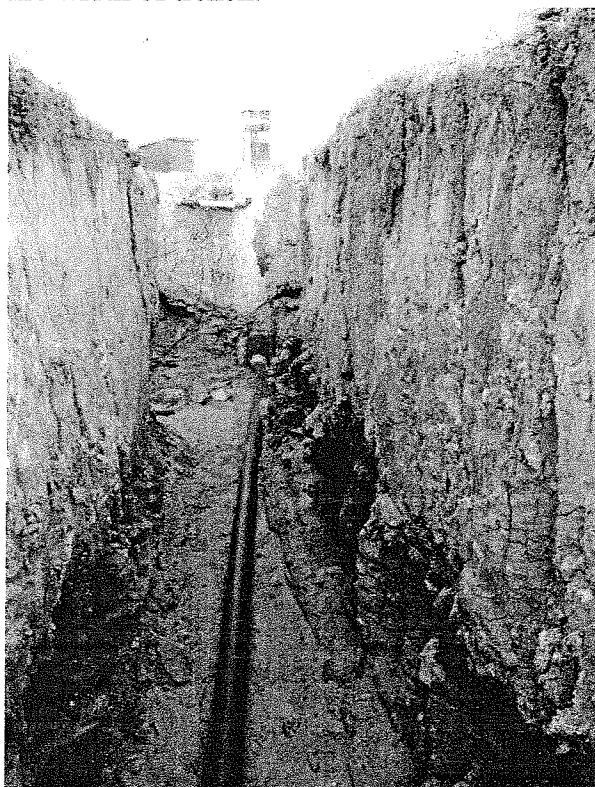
New 3" diameter HDPE line; looking towards connection to existing line.
